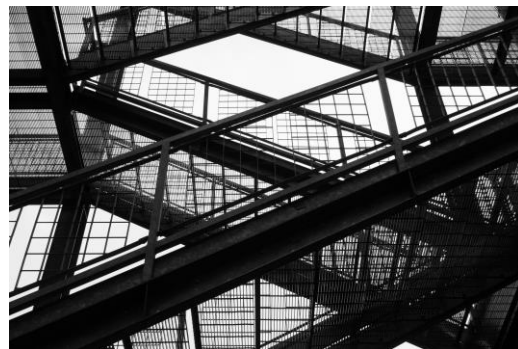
Roof access and external building access for firefighters (Steelway, 2020)
